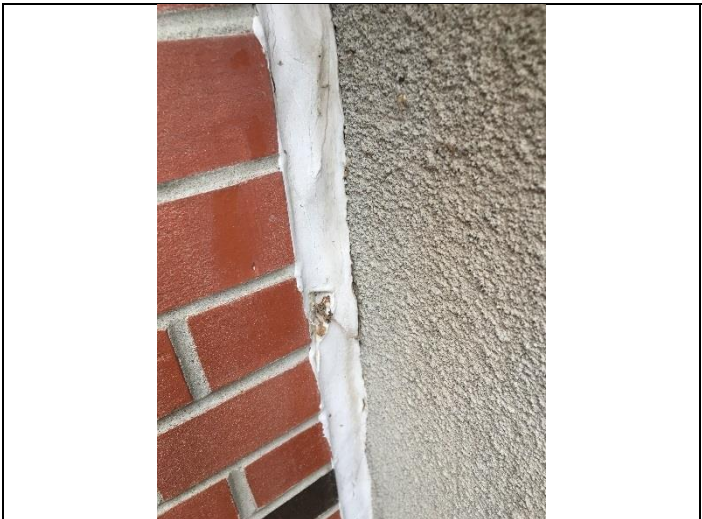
White Joint Caulk – Entry to Mech. Room
